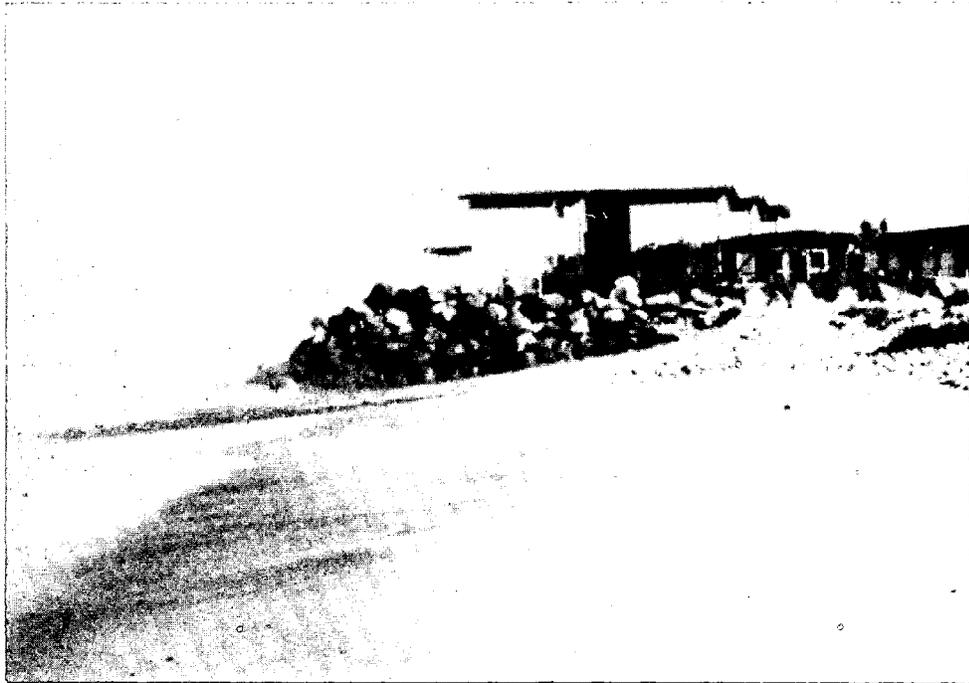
Revetment protects this North San Clemente Beach dwelling.
